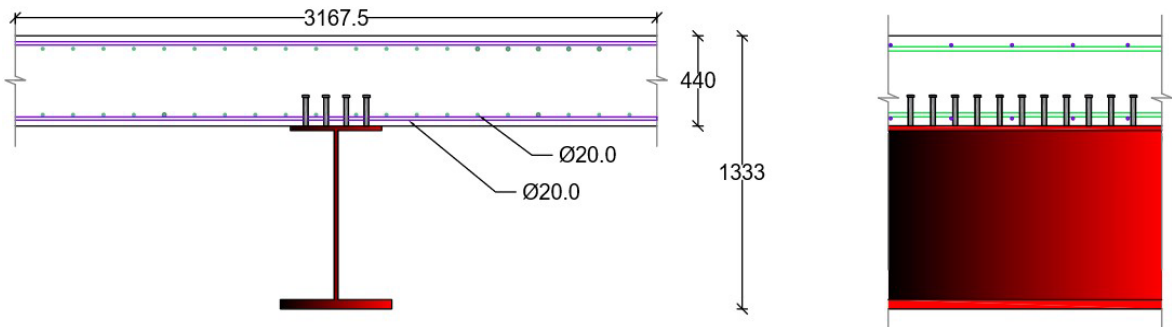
Construction details of TRA-S20-LH15-W solution (dimensions in mm).
